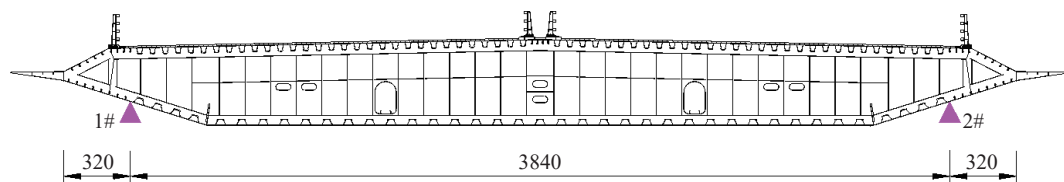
Horizontal layout of deflection measurement points of general section (unit: cm)
